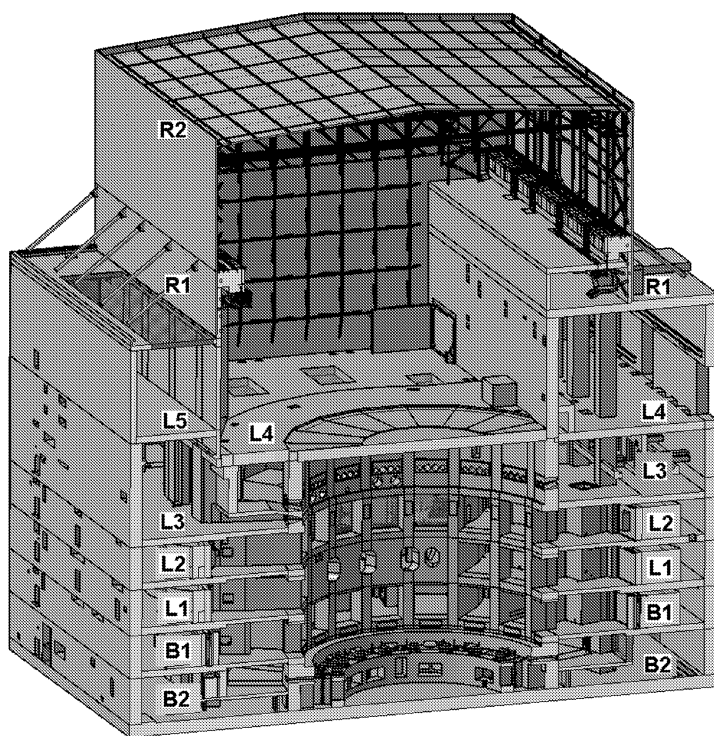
Cross-section of tokamak building 11 for levels B2–R2
